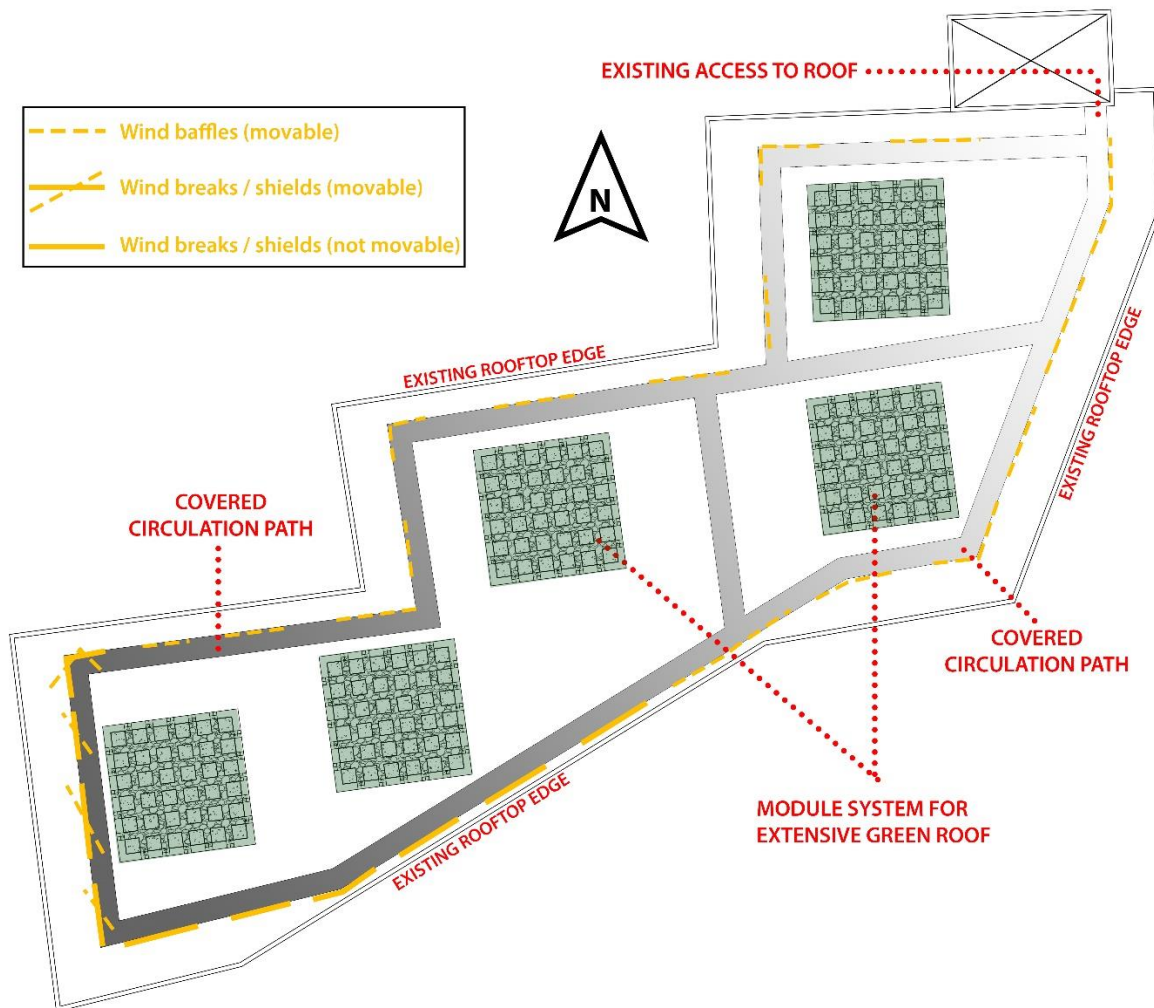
Extensive green roof system for Lor Moughayzel High School for Girls - plan (Prepared by: author)
